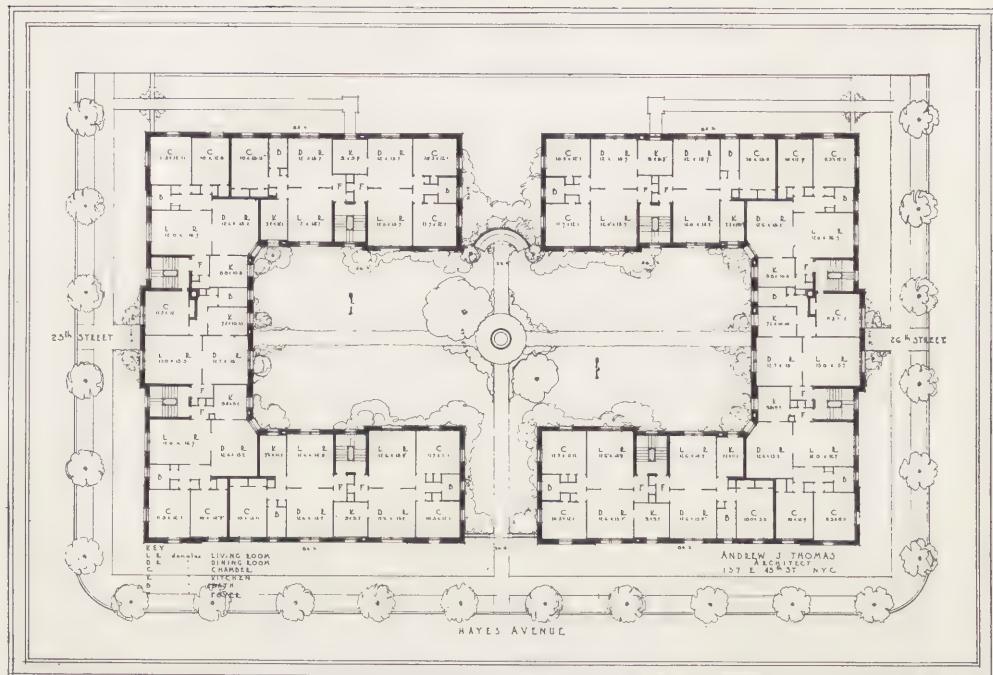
FLOOR PLANS—TWO GROUPED APARTMENT BUILDINGS FOR THE HAYES AVENUE APARTMENTS, INC., JACKSON HEIGHTS, NEW YORK CITY.
